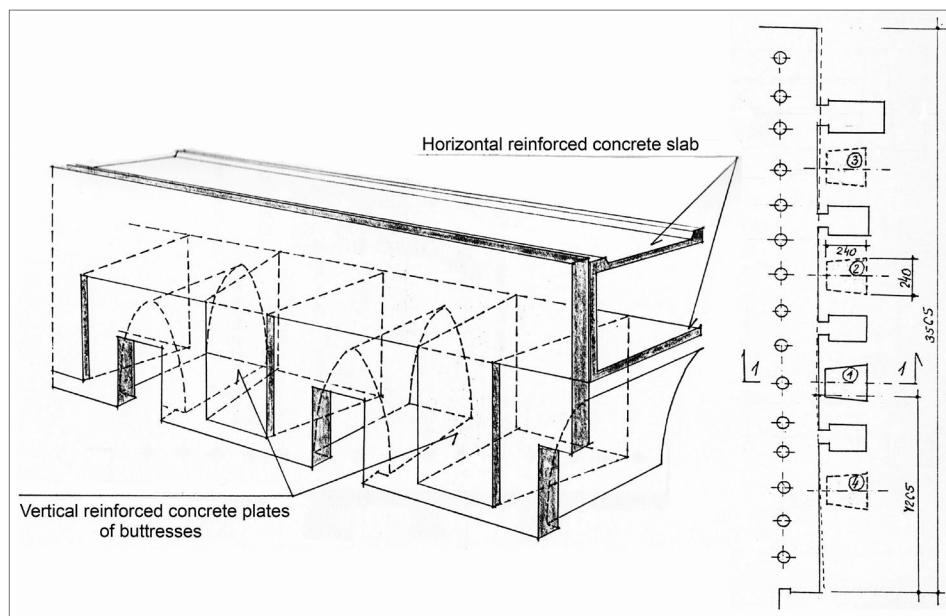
Selected sections of the Northern Colonnade wall protection project (T. Dziedzic based on Połoczanin 1988 and Macur 1989)
